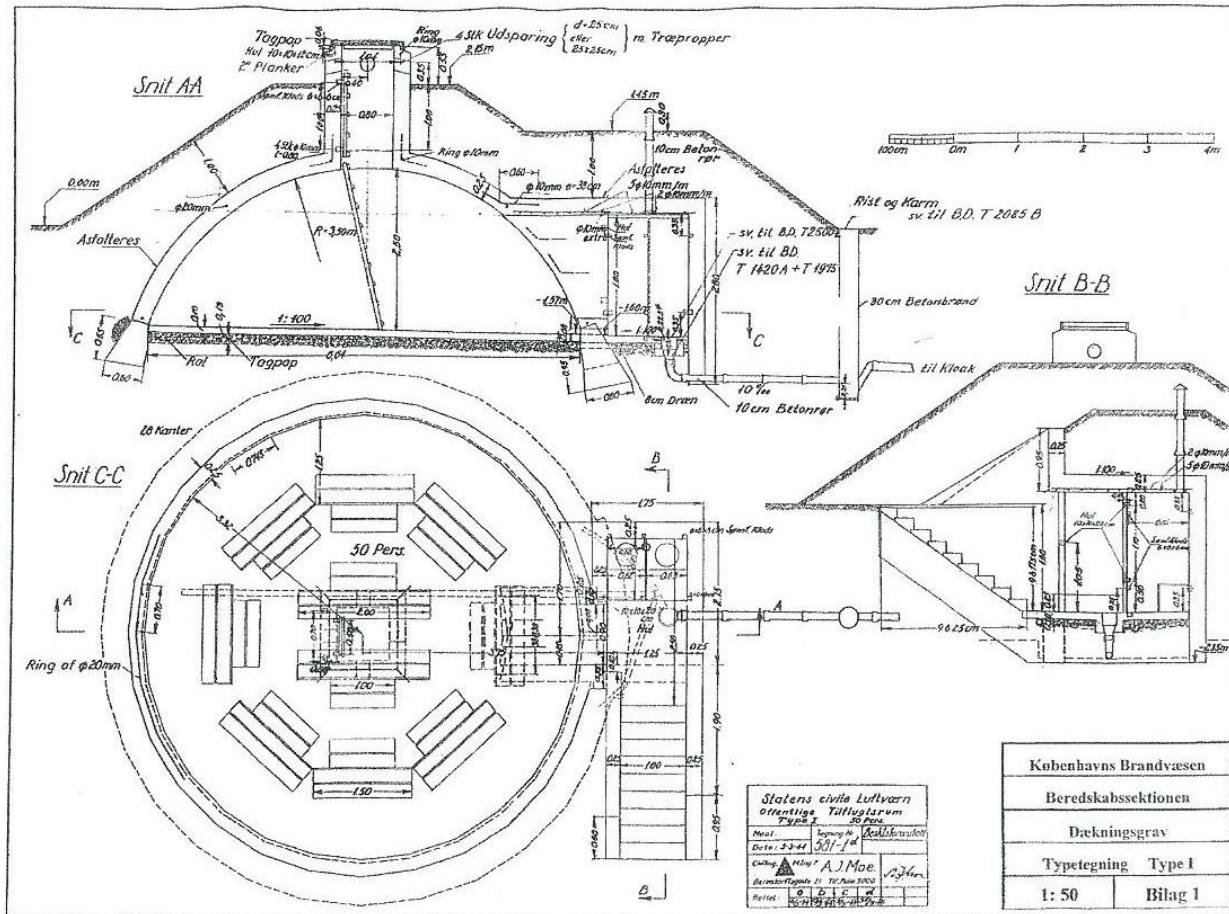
Construction drawing of concrete shelter, type I. From Museum of Copenhagen.
